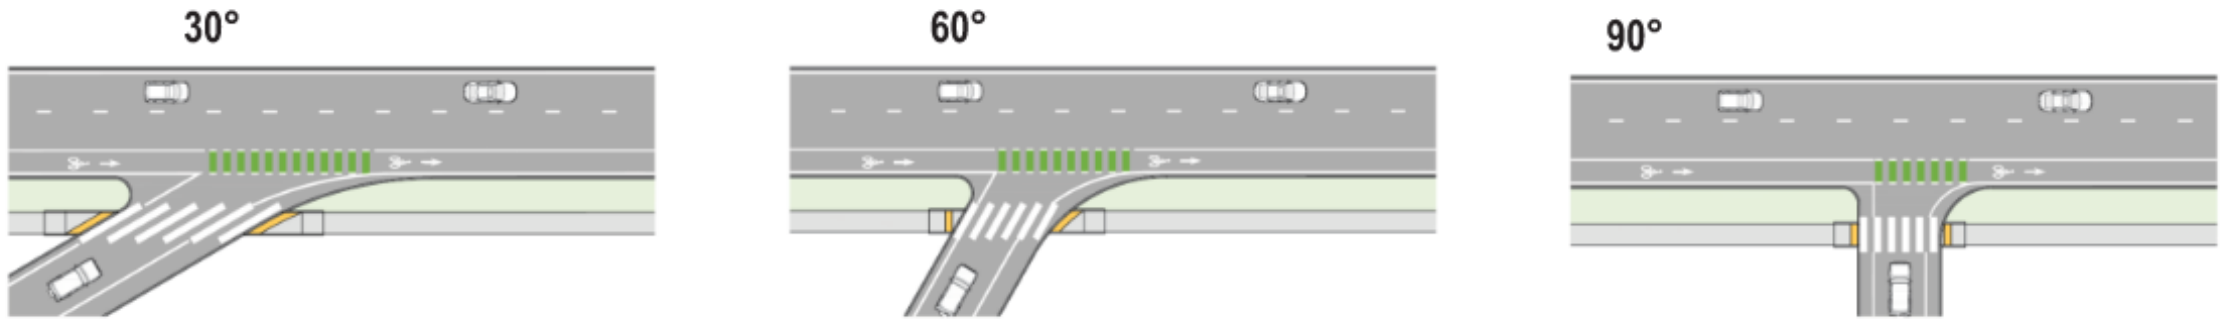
Examples of 30-, 60-, and 90-Degree Roadway Intersections
